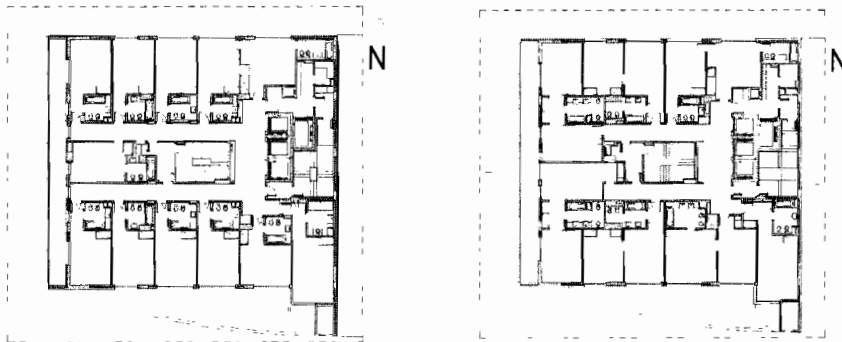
Plant of 2 to 11 floors (left) and plant of 12 floor (right).
